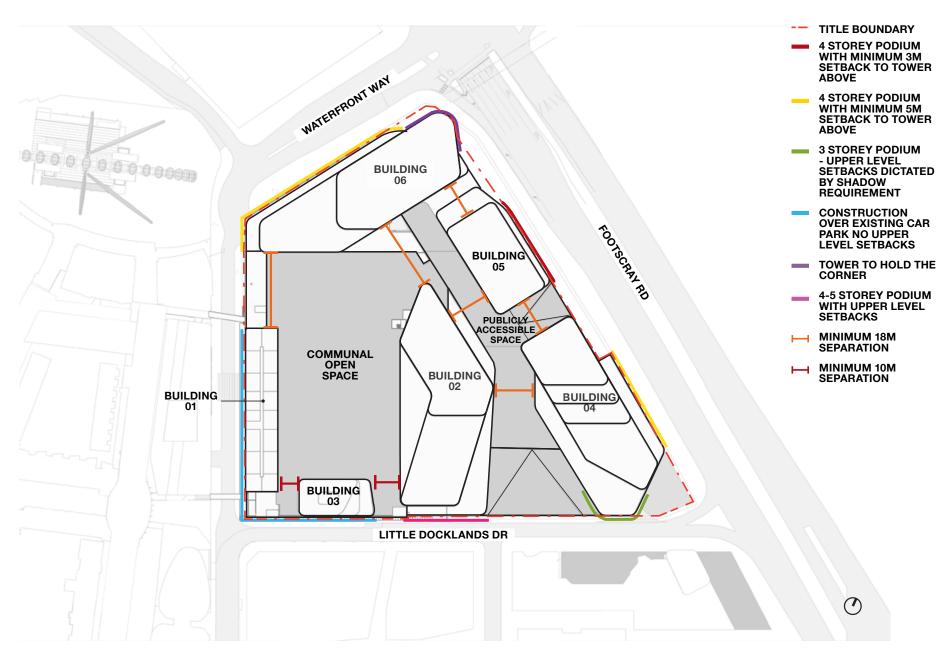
Concept Plan 7 - Podium Heights, Tower Setbacks and Tower Separation - Roof Plan
